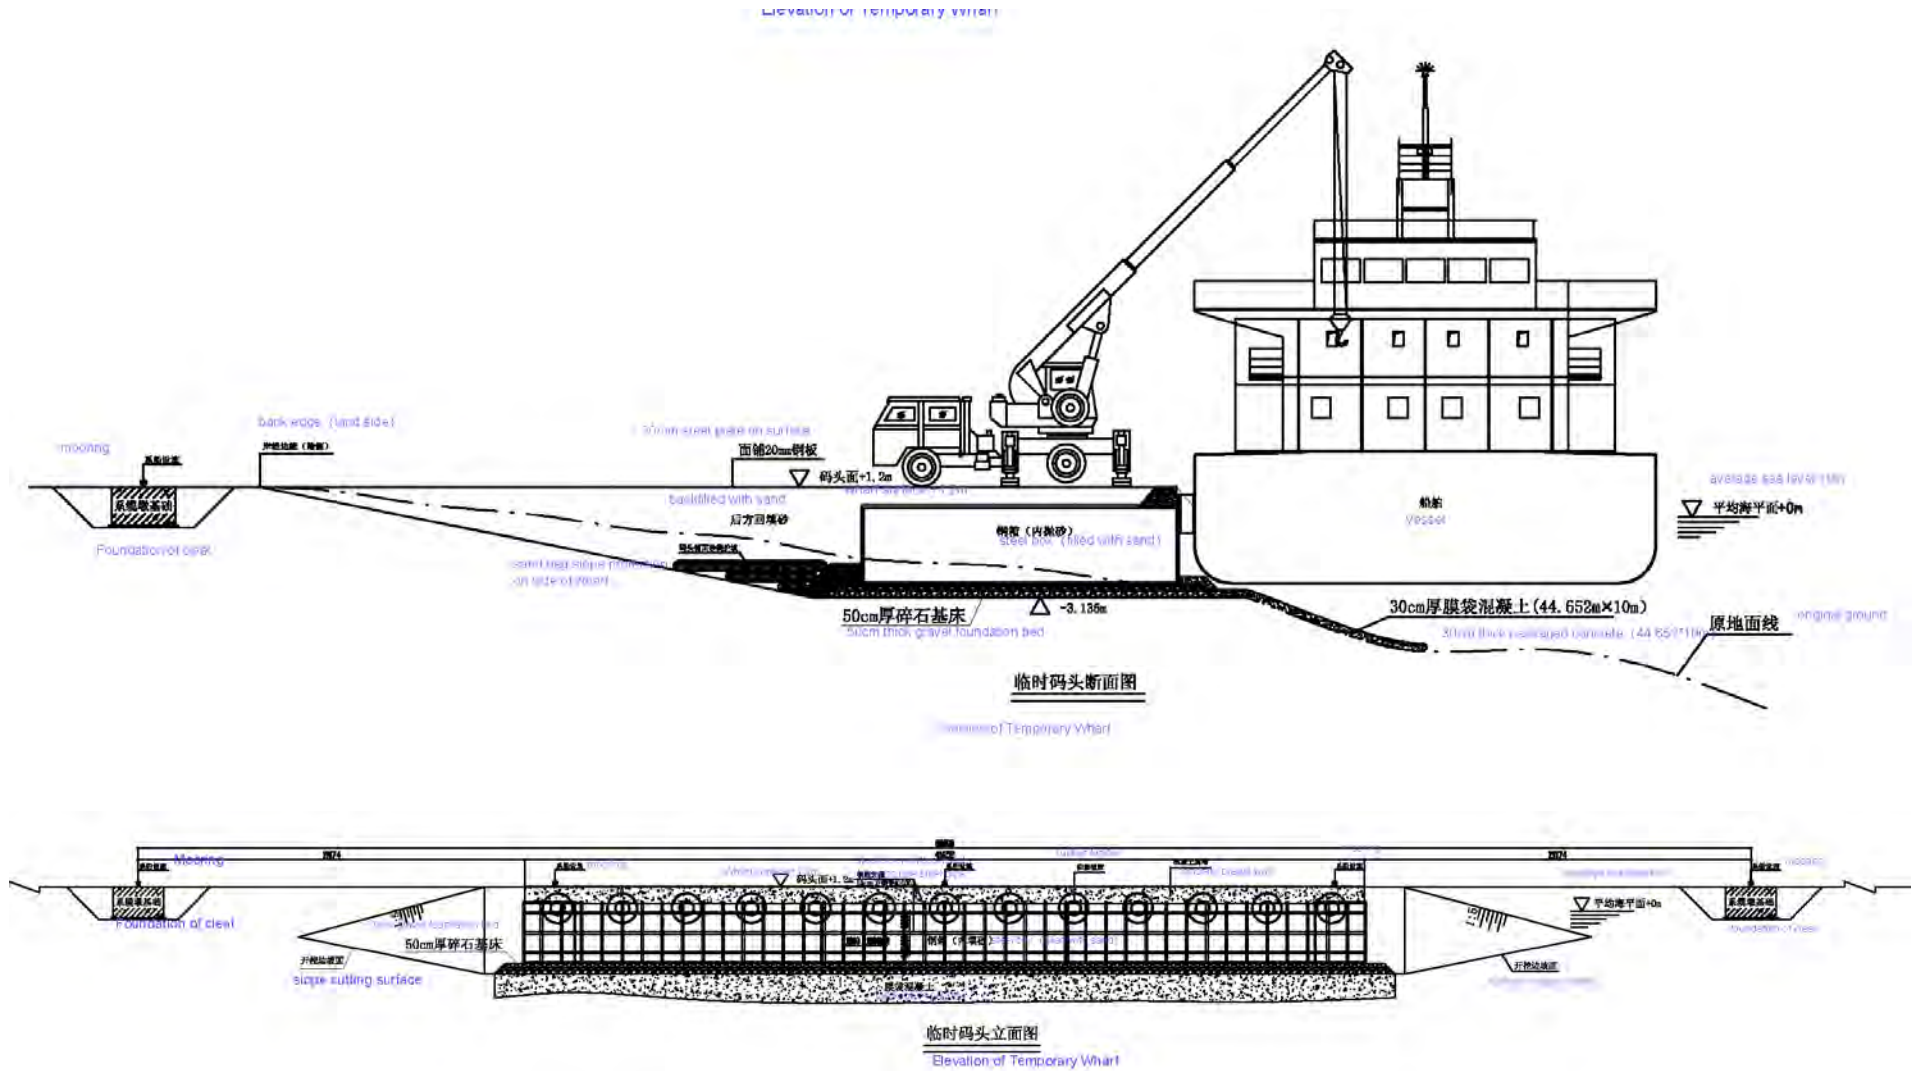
Proposed Jetty Site Plan – Elevation view
